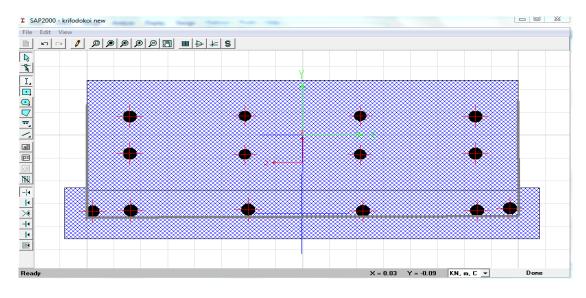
Retrofitting of beam using section designer by adding a 10 cm layer of shotcrete with reinforcement and stirrups
